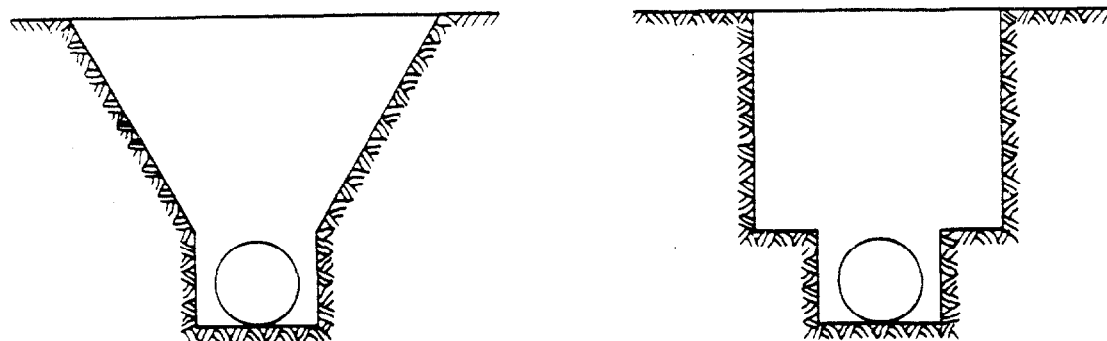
Subtrench installation in a wide trench.<sup>(2)</sup>
